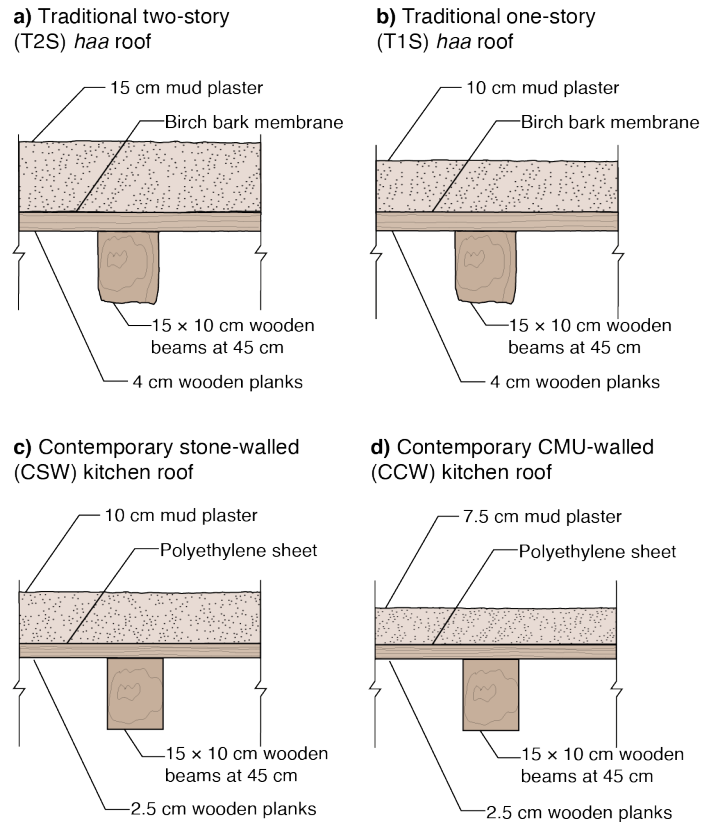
Roof constructions in the sampled houses: a) T2S haa, b) T1S haa, c) CSW kitchen, d) CCW kitchen. All roofs consist of wooden beams and planks with waterproofing membranes and mud plaster layers, with variations in material thickness. Traditional houses used birch bark as the waterproofing membrane, whereas contemporary kitchens used polyethylene sheets.
